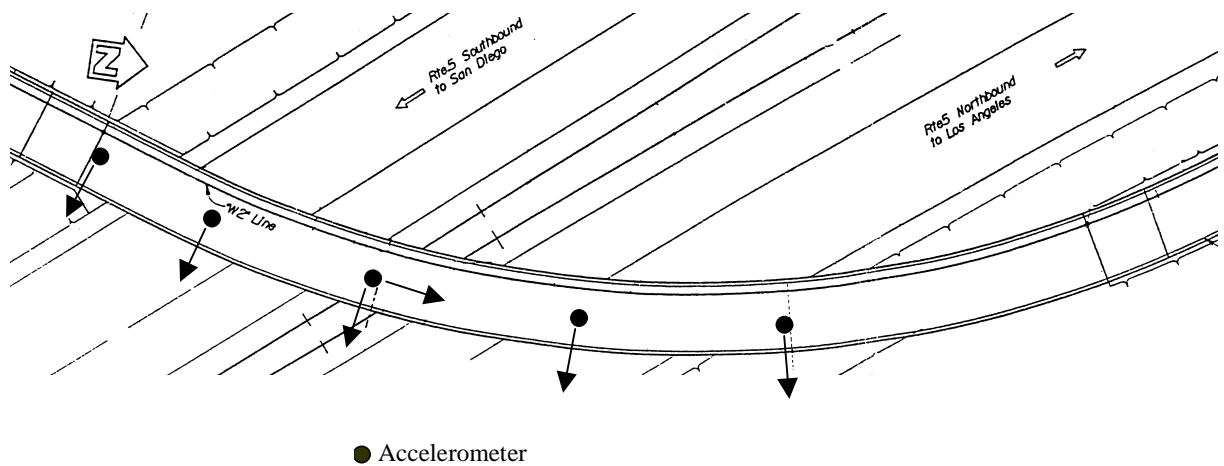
Accelerometer Arrangement at West Street On-Ramp; Plan
